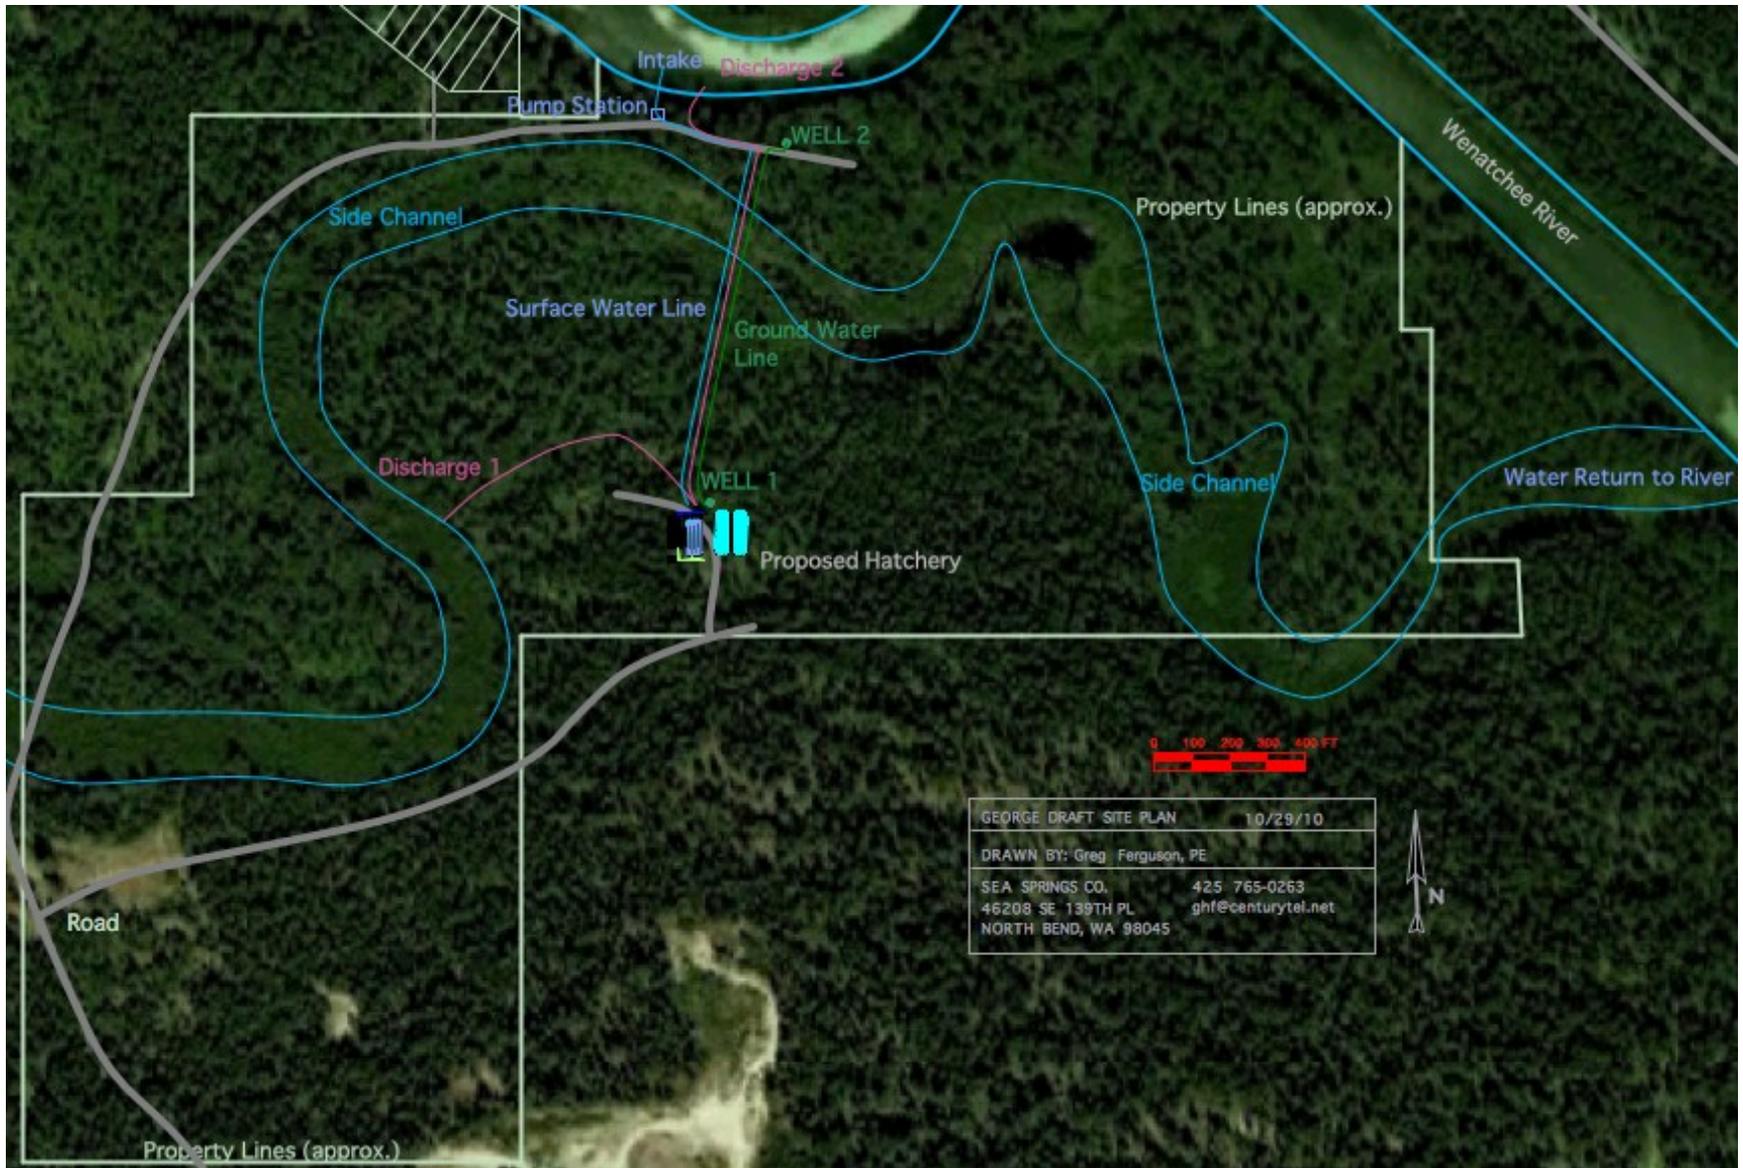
George Hatchery (Backup Site): Draft Site Plan
